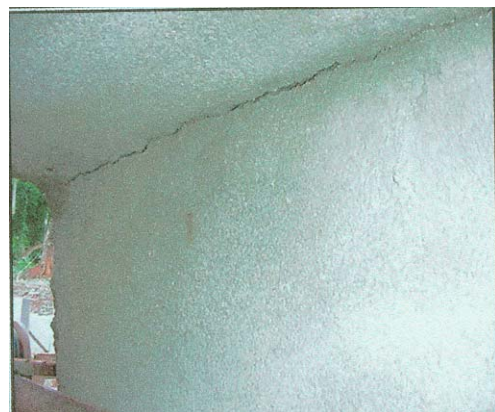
Typical defect of the angular connection with load equal to 1591 kg (3500 pounds)
